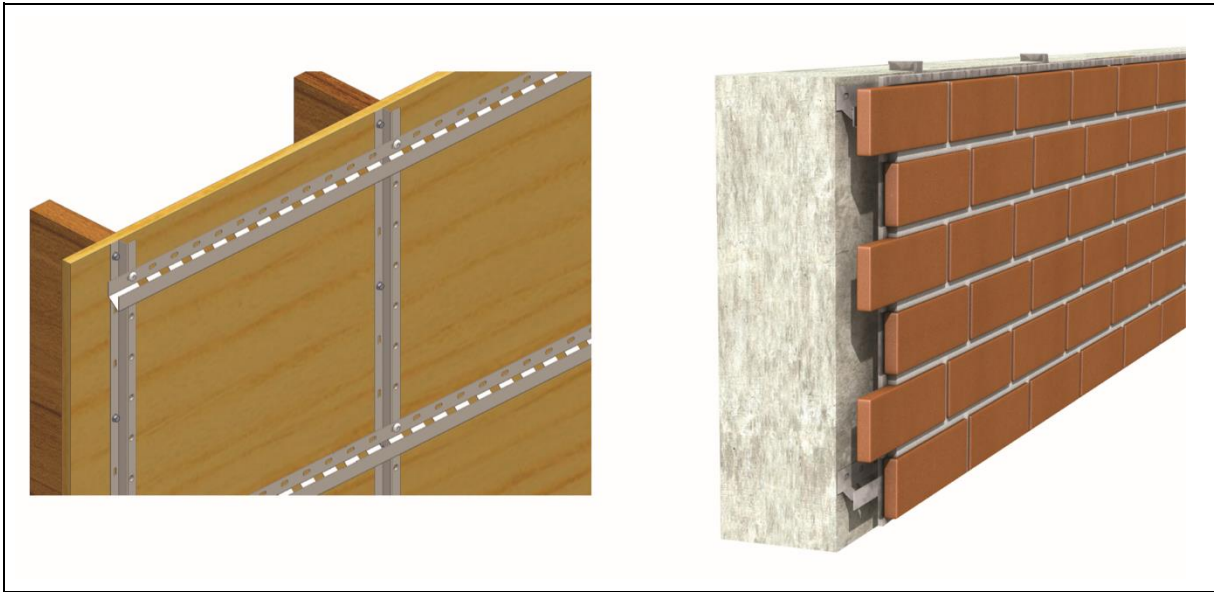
SK wall bracket fixed to the load bearing wall and JK extension bracket and vertical rail
